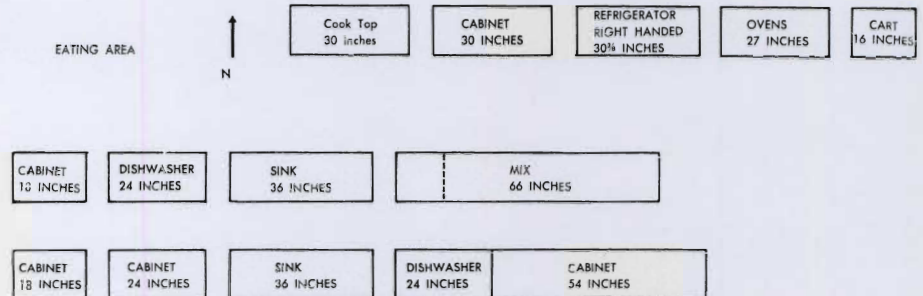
Blocks for corridor kitchen with built-in cooking equipment on north wall and dishwasher in different locations on south wall.
